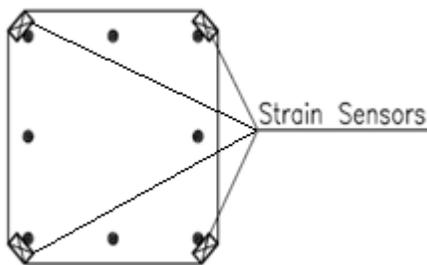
Strain Sensors at Bottom Cross- Sections of the Columns at the Ground Floor Level
